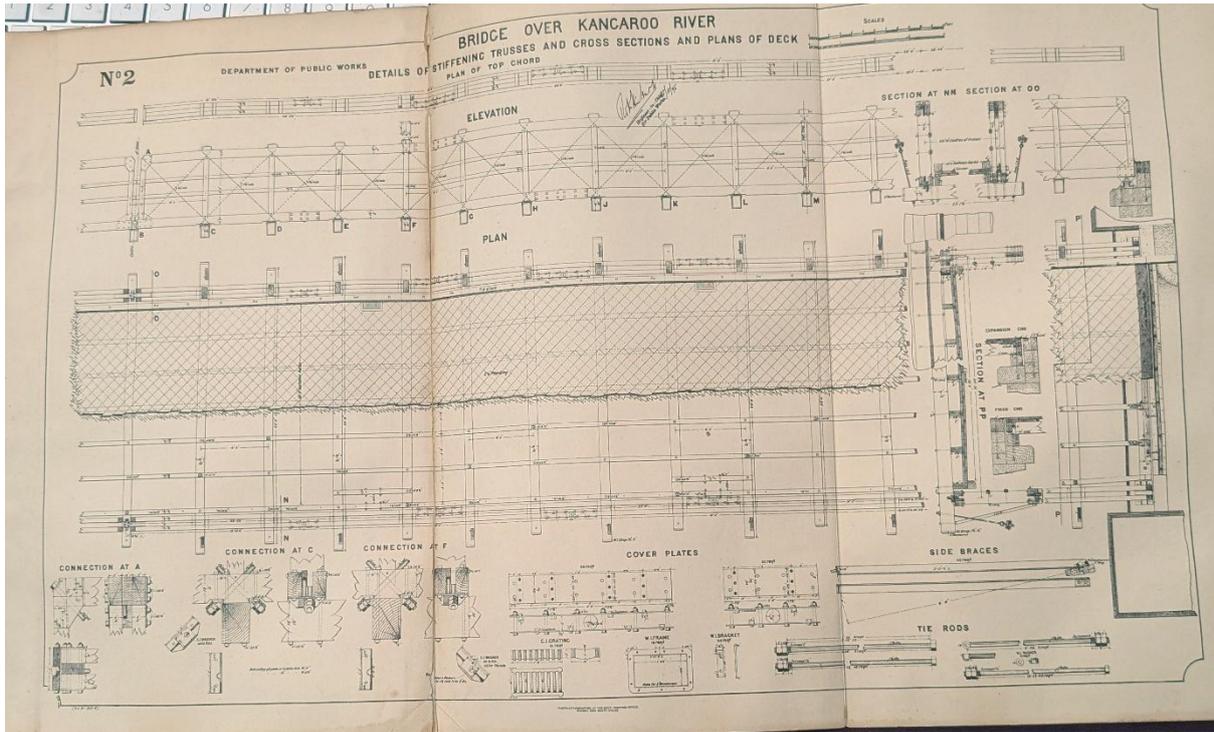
Details of Stiffening Trusses and Cross Sections and Plans of Deck, 1895 (Mitchell Library, Q624.23/1 – Sheet No. 2) Pratt truss 4.27 m deep, Oregon pine chords, steel diagonals, 18 ft roadway + 2 × 1.2 m footways
